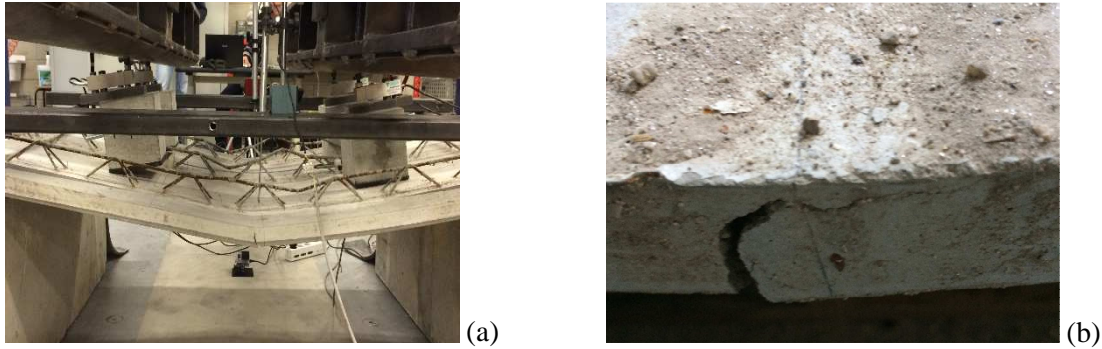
Failure modes of the pedalles: (a) general deformed shape; (b) detail of midspan crack
